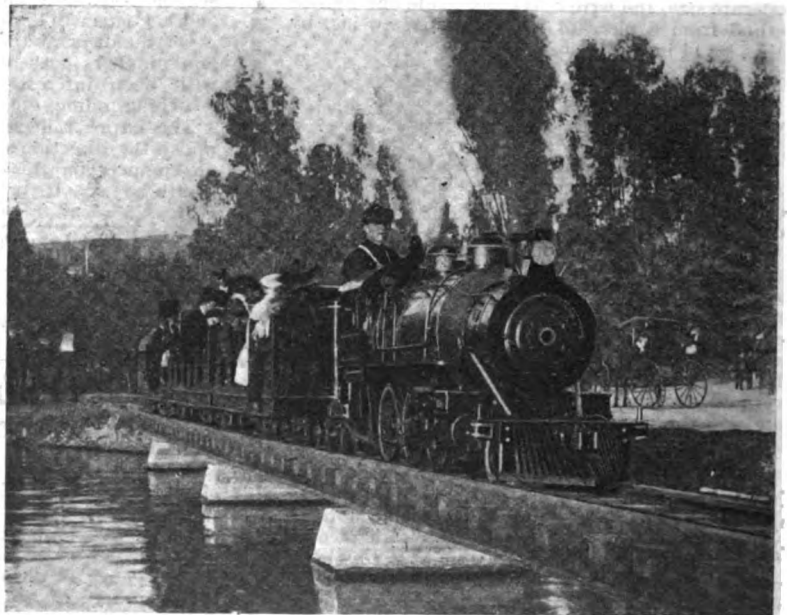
TRAIN CROSSING CONCRETE AND STEEL TRESTLE BRIDGE.
